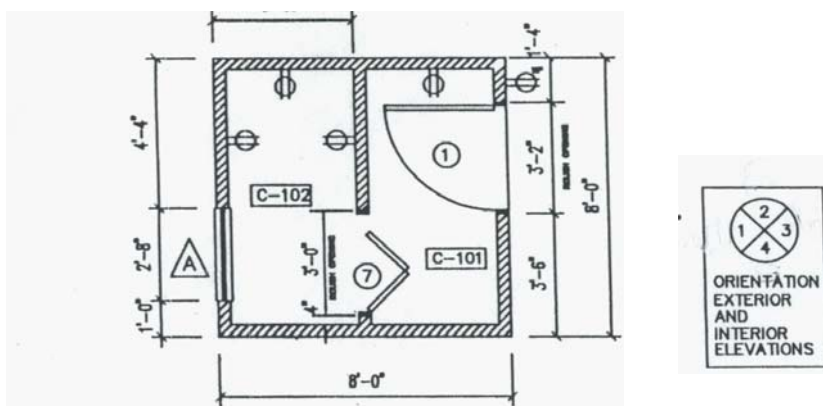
Floor plan for Modules S-3, S-3a and C-3. Walls were numbered according to the orientation key. Wall 1 is the North wall. Compass orientations are nominal.
